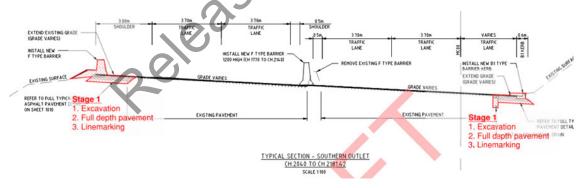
Typical section – Southern Outlet Ch. 2040 to Ch. 2181.42
